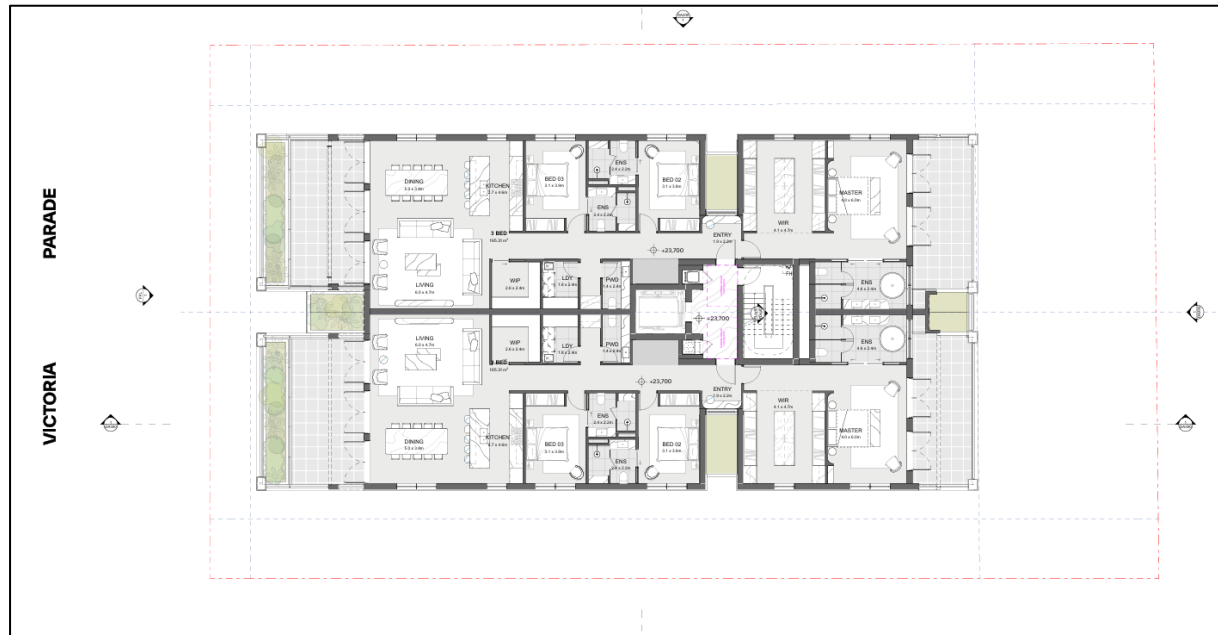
Floor Plan for Level 6 (Source: PBD Architects, 2026)
